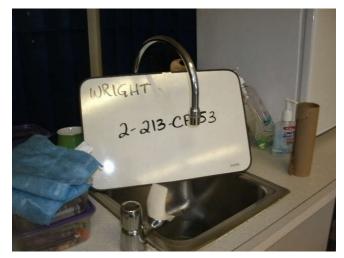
Classroom faucet w/bubbler, located on the 2nd floor, in room 213.
